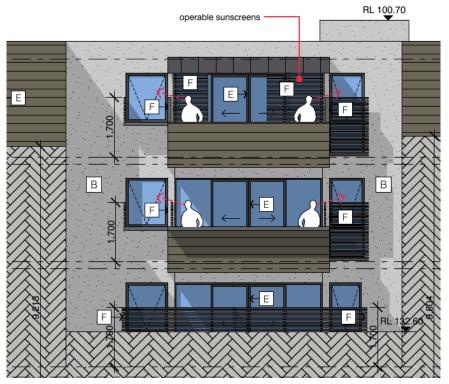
West elevation depicting the balcony treatments on level 1, 2 and 3
